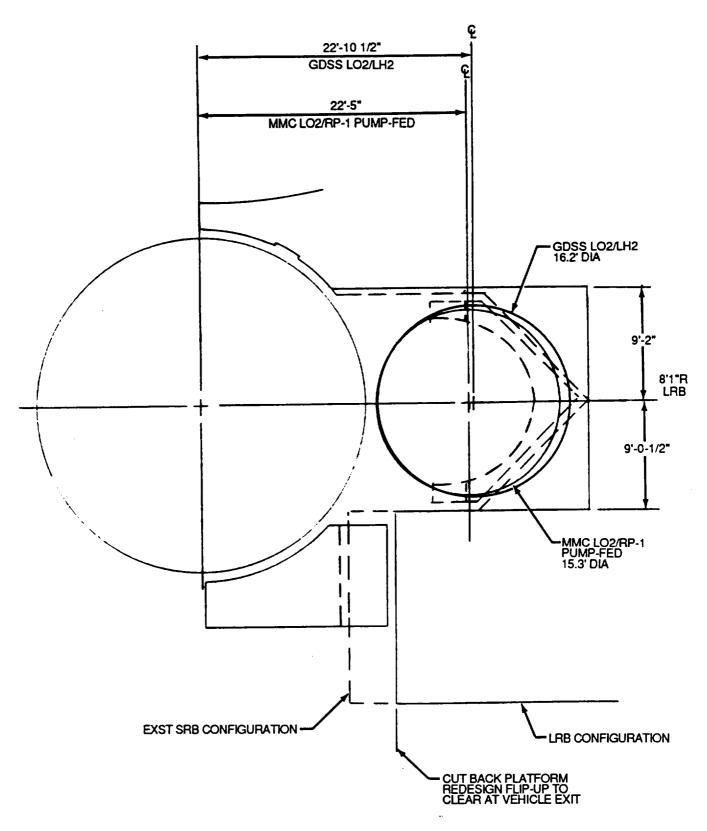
Main Floor - Platform 'B' Interferences 2nd Floor & Roof (Similar)
